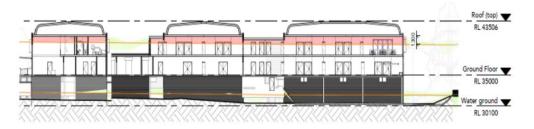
Section A with 8 metre projected existing ground plane (Source: Team 2 Architects)
